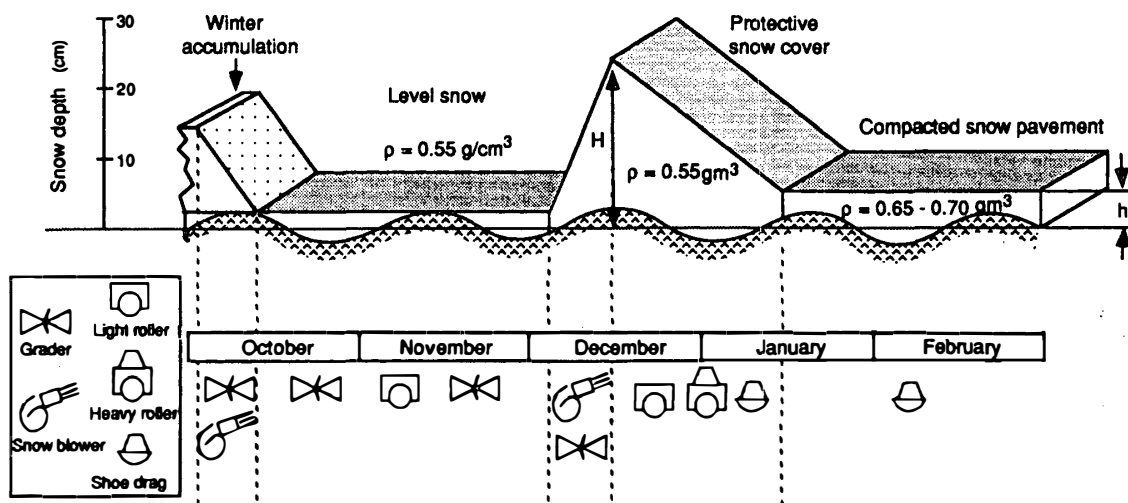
Schematic outline of protective snow pavement construction on a blue-ice runway affected by melting.
